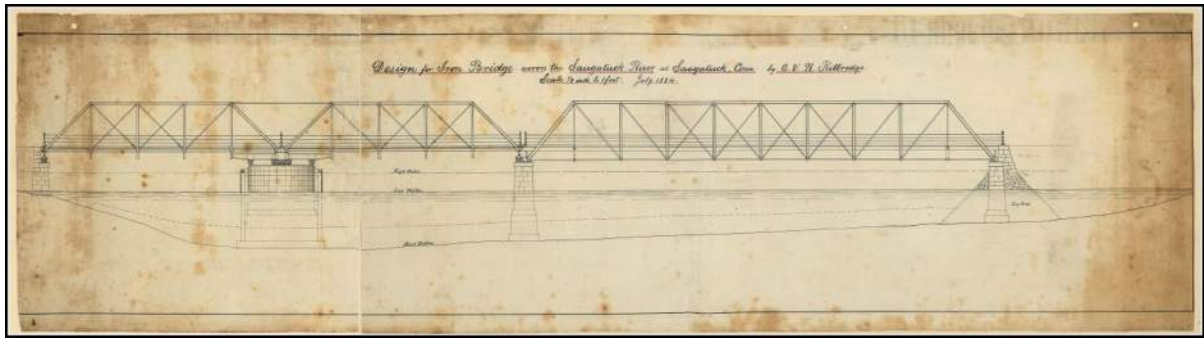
"Design for Iron Bridge over the Saugatuck River at Saugatuck, Conn." (July 1884). The elevation is an early design drawing of Bridge #01349 and shows the three-span Pratt Truss superstructure, masonry abutments, center pivot and fixed piers.
